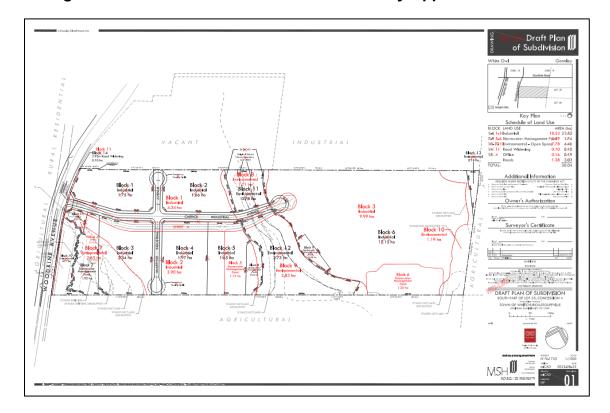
Redline Revisions to the Previously Approved Draft Plan
